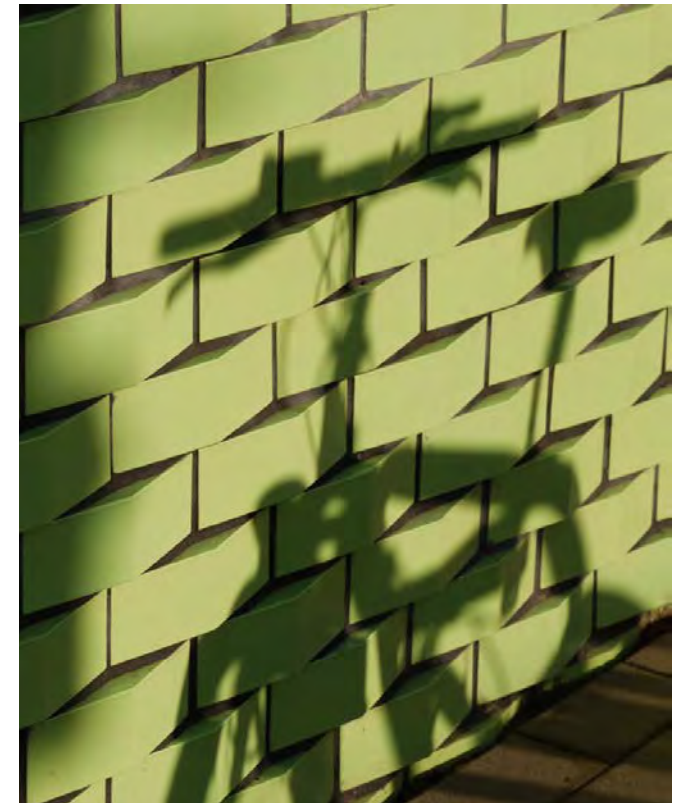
West Hampstead Thameslink Station - Feature Wall
